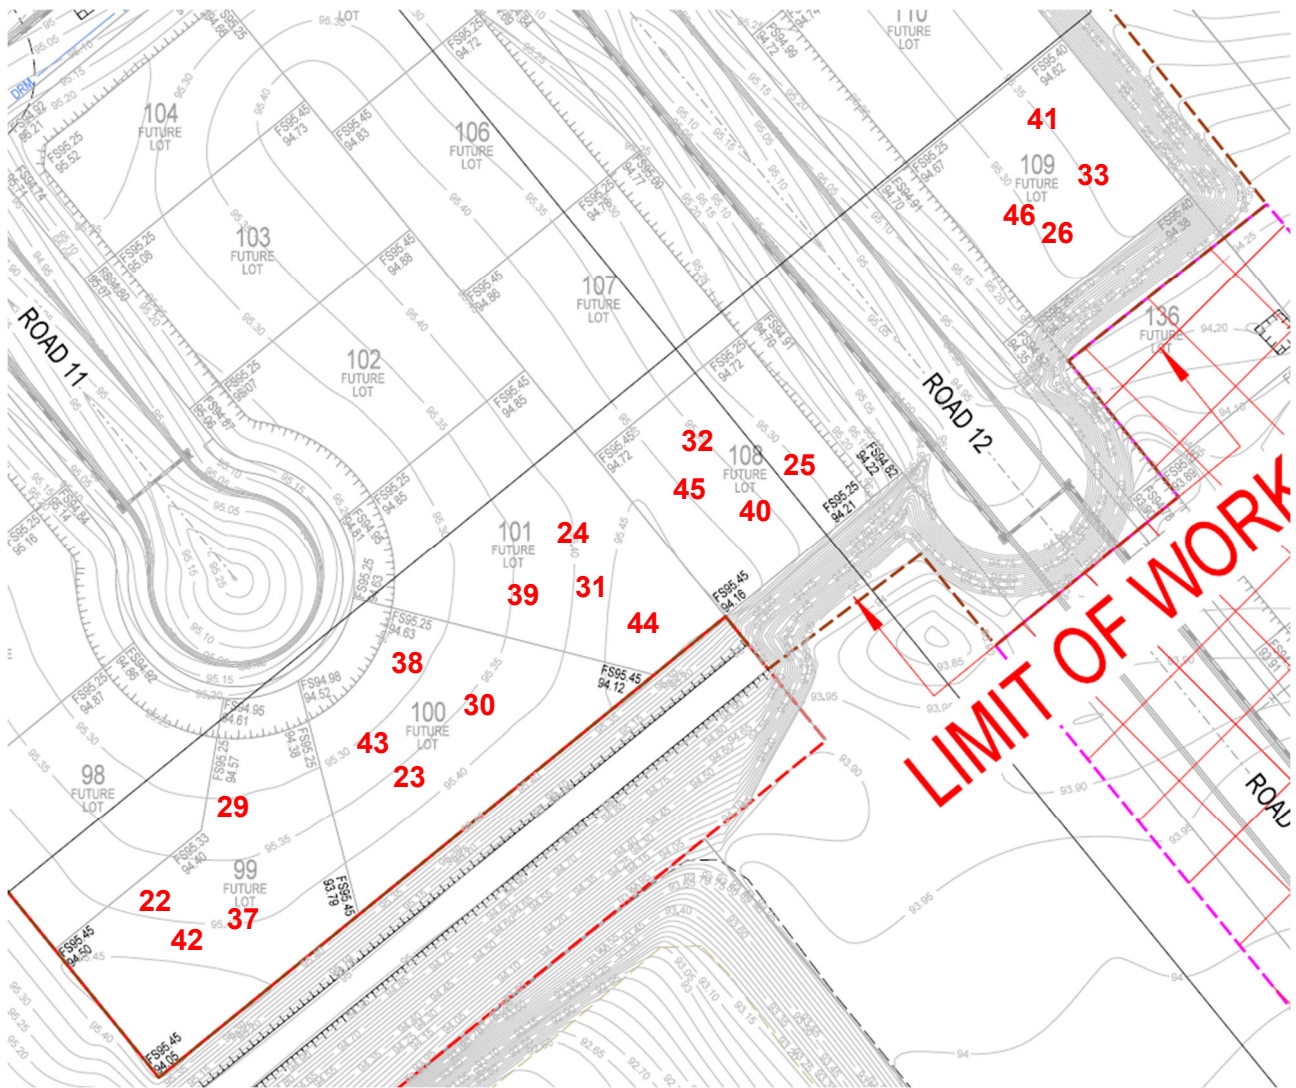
Site Plan – Lots 99 to 101 and 108 to 109
